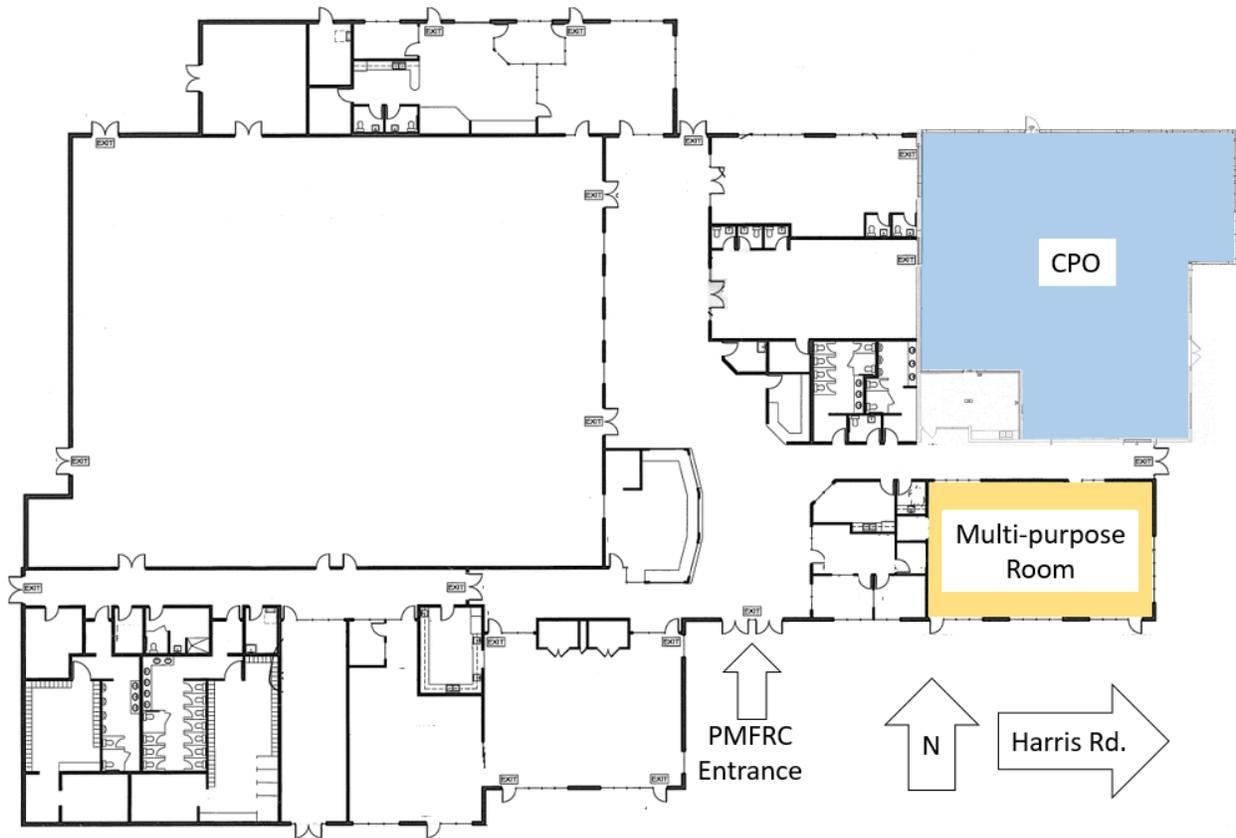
Floor Plan of Existing Multi-Purpose Room in PMFRC and the CPO
